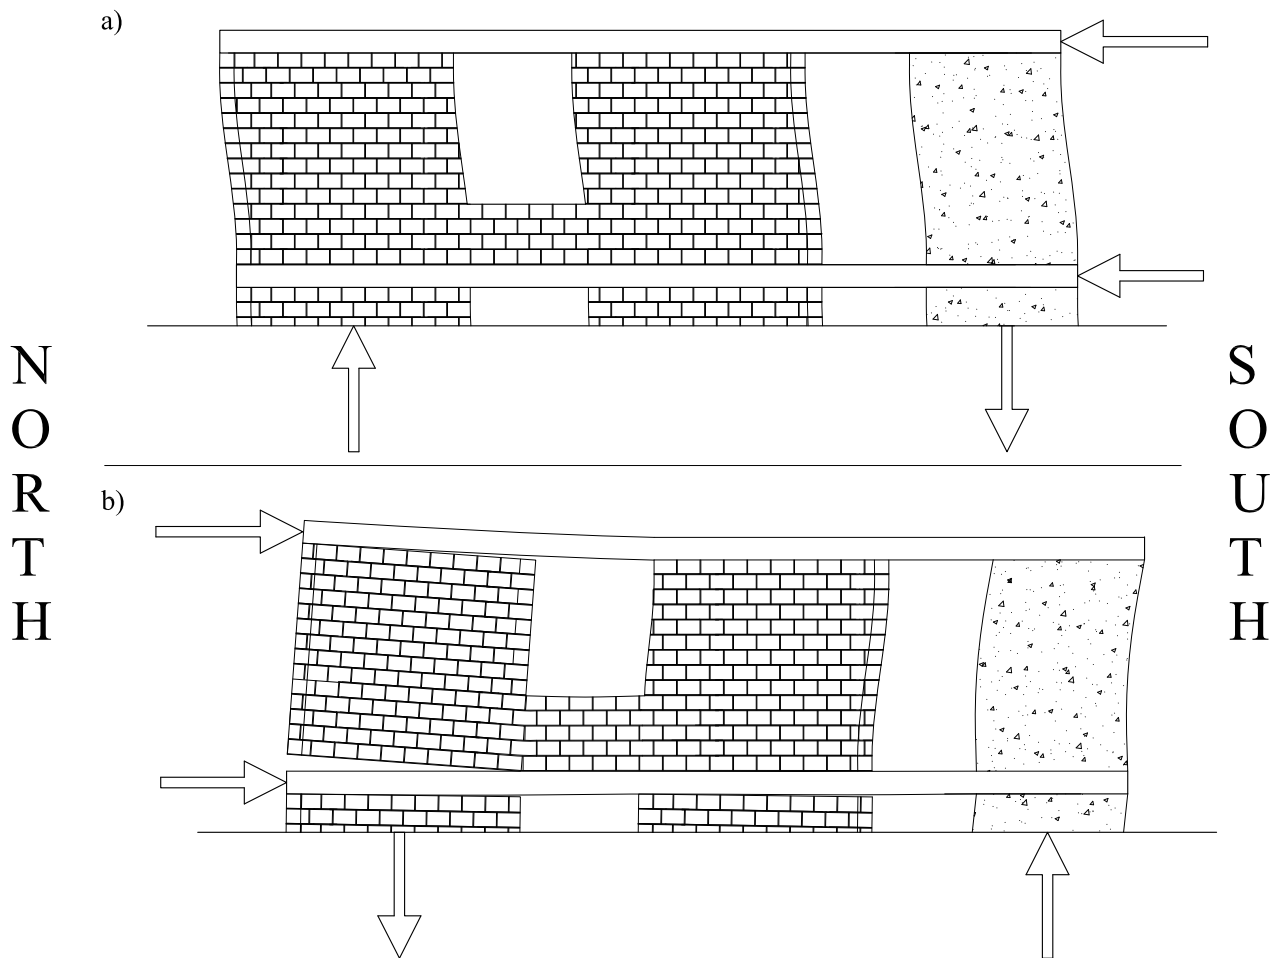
Schematic diagram of the effect of the loading direction: a) loading from South to North and b) loading from North to South.
